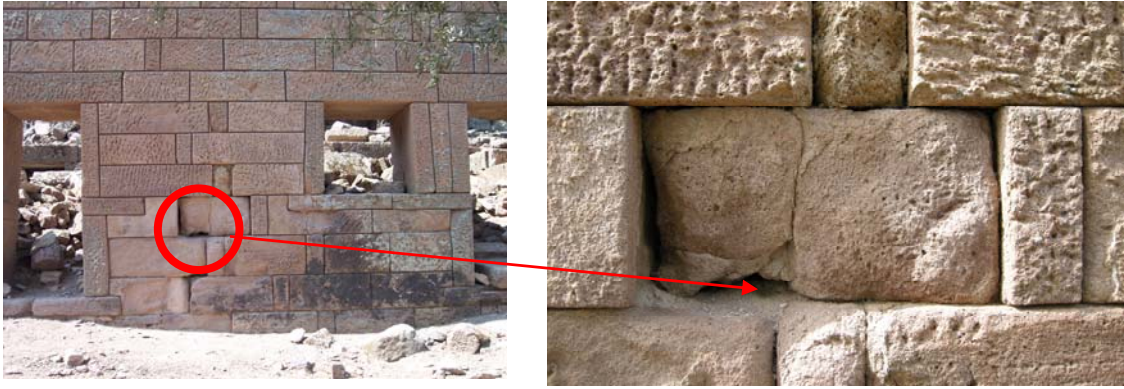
Southeast facade of the wall, showing where the andesite samples were collected (A.St.3)
